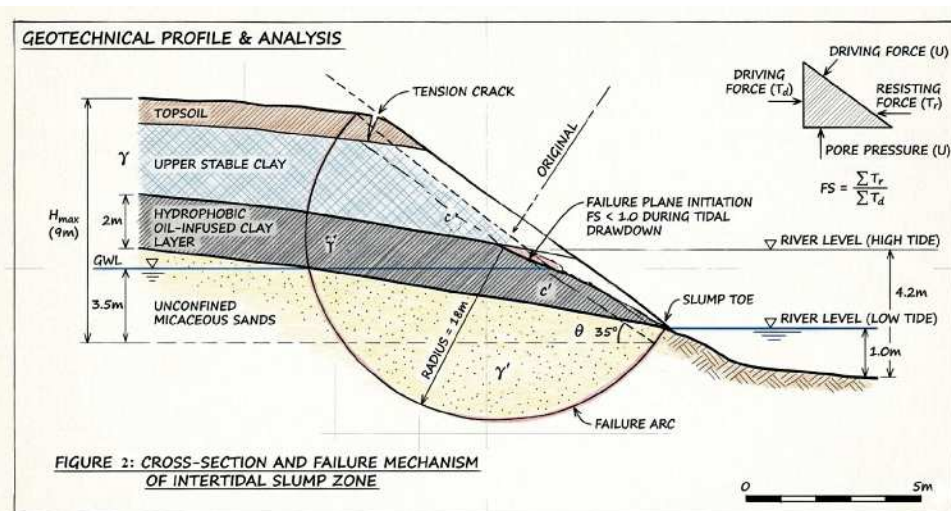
Cross-Section and Failure Mechanism of Intertidal Slump Zone
